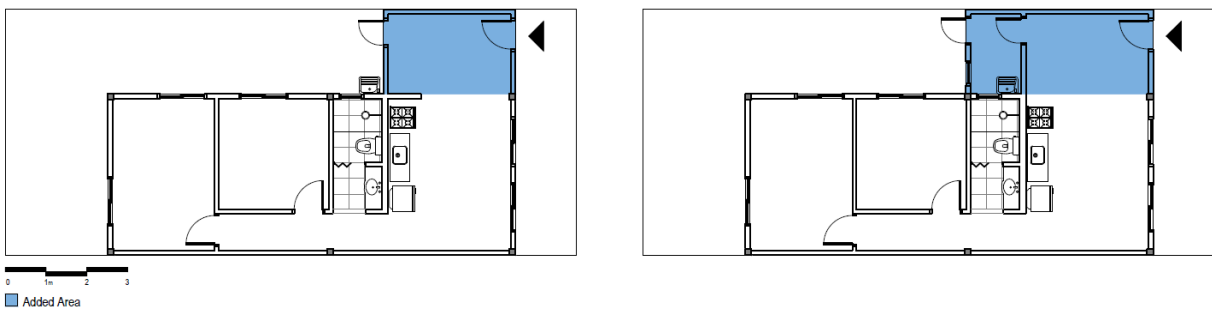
Floor plan inserted in the lot – option 2.
